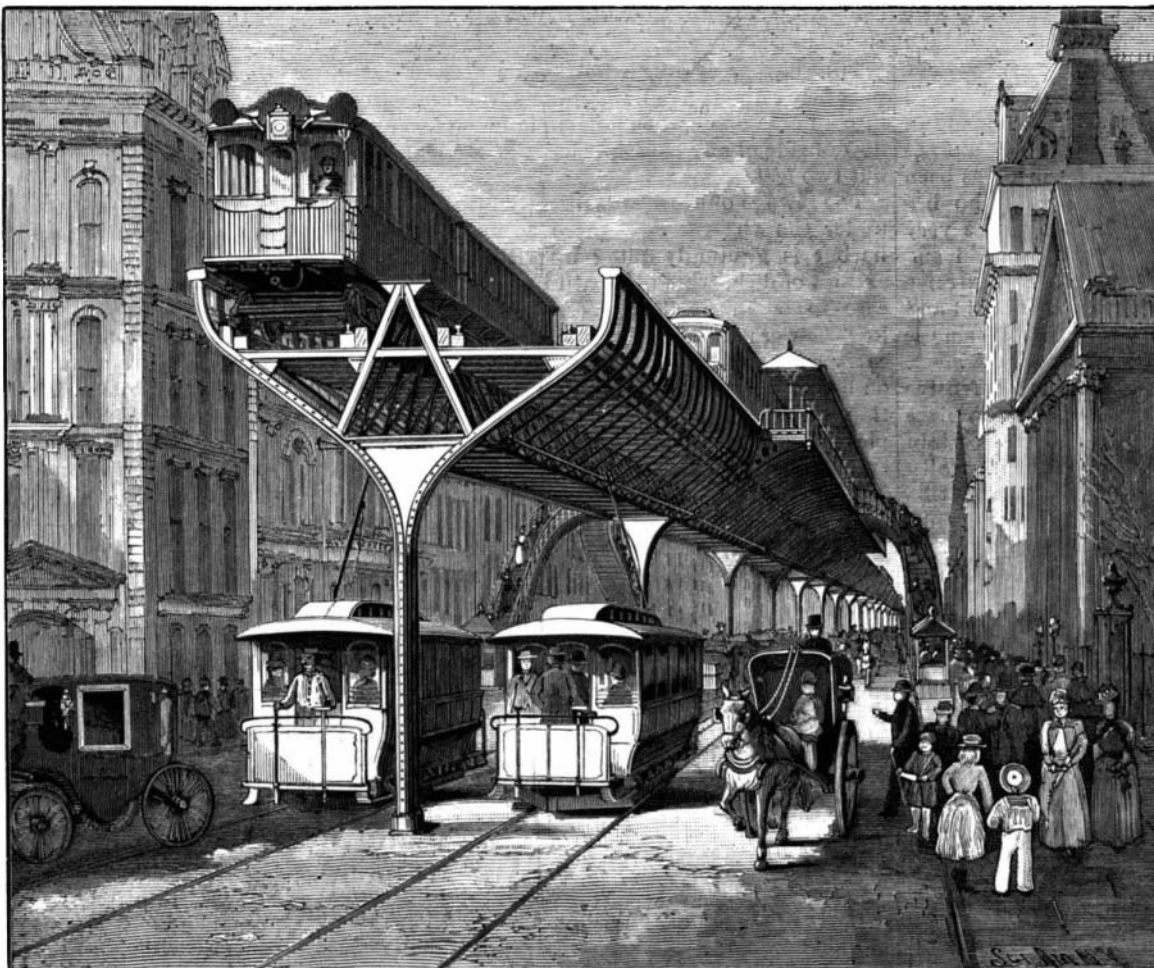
DETAIL ELEVATION OF CLARKE RAILROAD SYSTEM.
